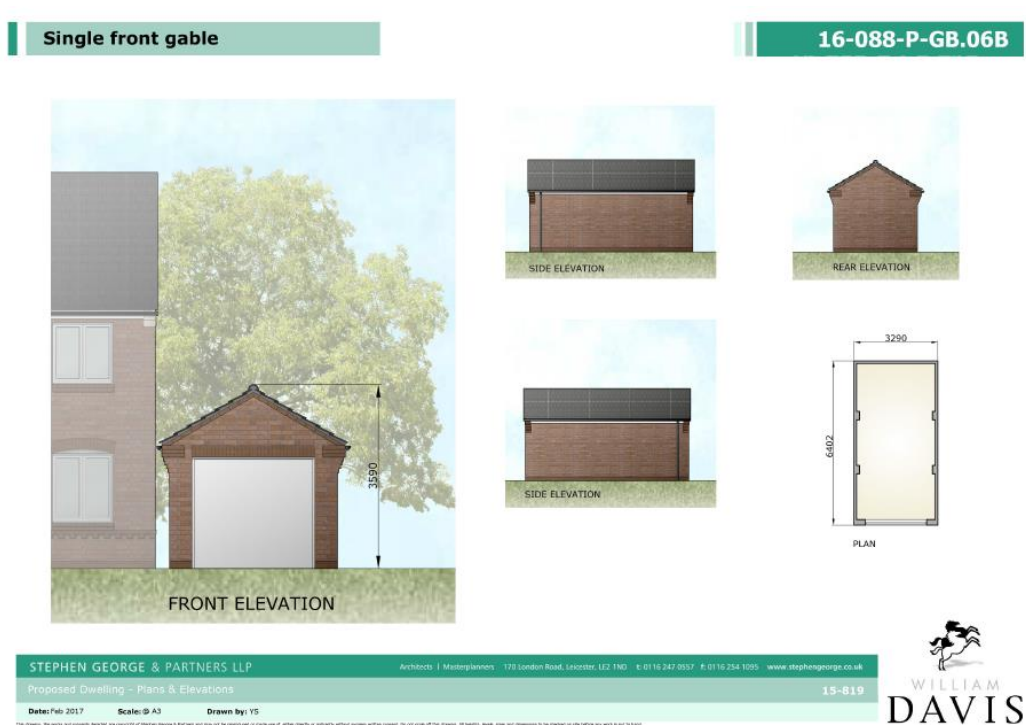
Single Garage Type GB06 - Typical Single Garage Design
